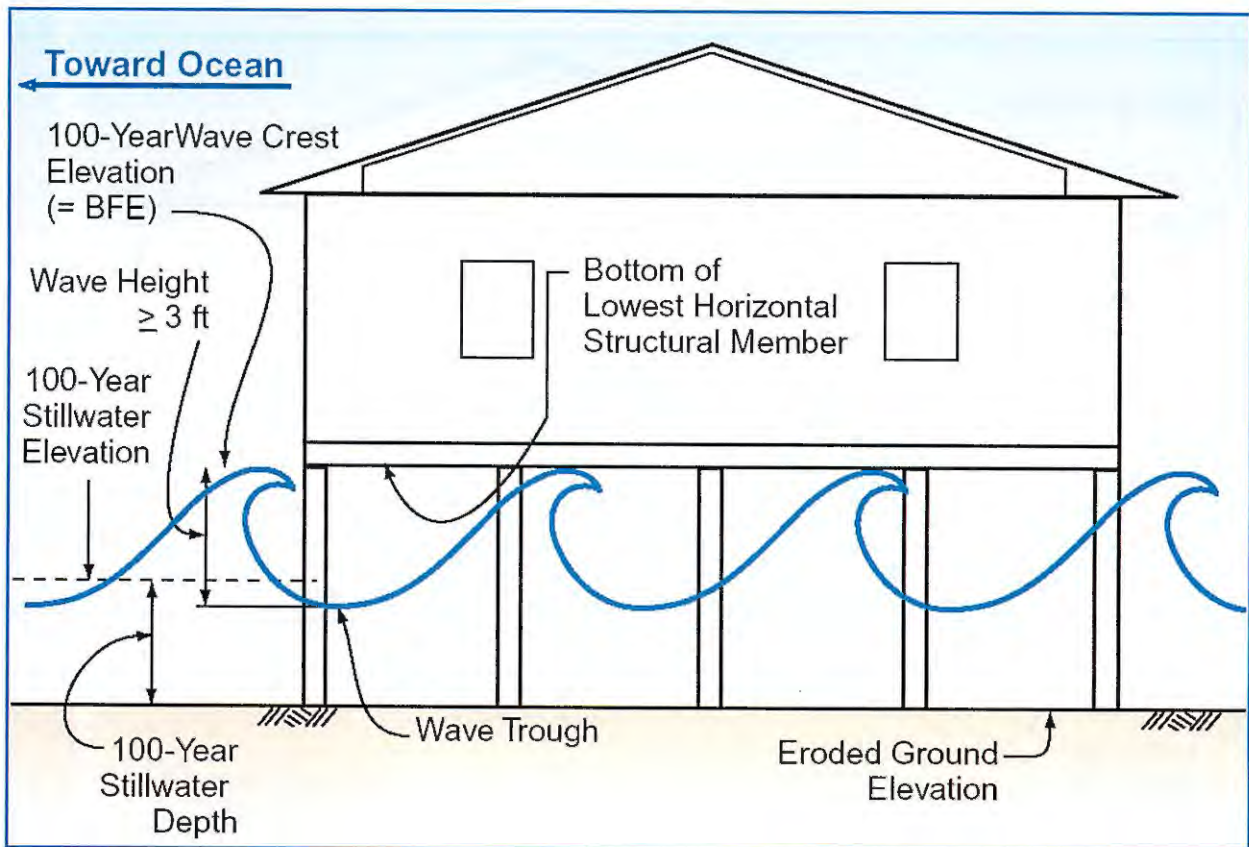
Minimum NFIP requirements for the V zone (From FEMA CCM, 2000). Under the National Flood Insurance Program, structures in the V zone must have the bottom of the lowest horizontal structural member elevated on pilings, post, columns or piers above the Base Flood Elevation (see Figure 2-7). The FEMA CCM recommends that the lowest structural member be elevated an additional distance above the BFE (adding freeboard) to create an extra margin of safety. By slightly exceeding the design flood elevation, major damage can be avoided. For most coastal states, the V zone is determined where the wave height is greater than 3 feet over the 100-year stillwater elevation. In Hawaii, the V zone is determined where the depth of water from the 100-year flood is greater than 4 feet (See Section 4.2).
